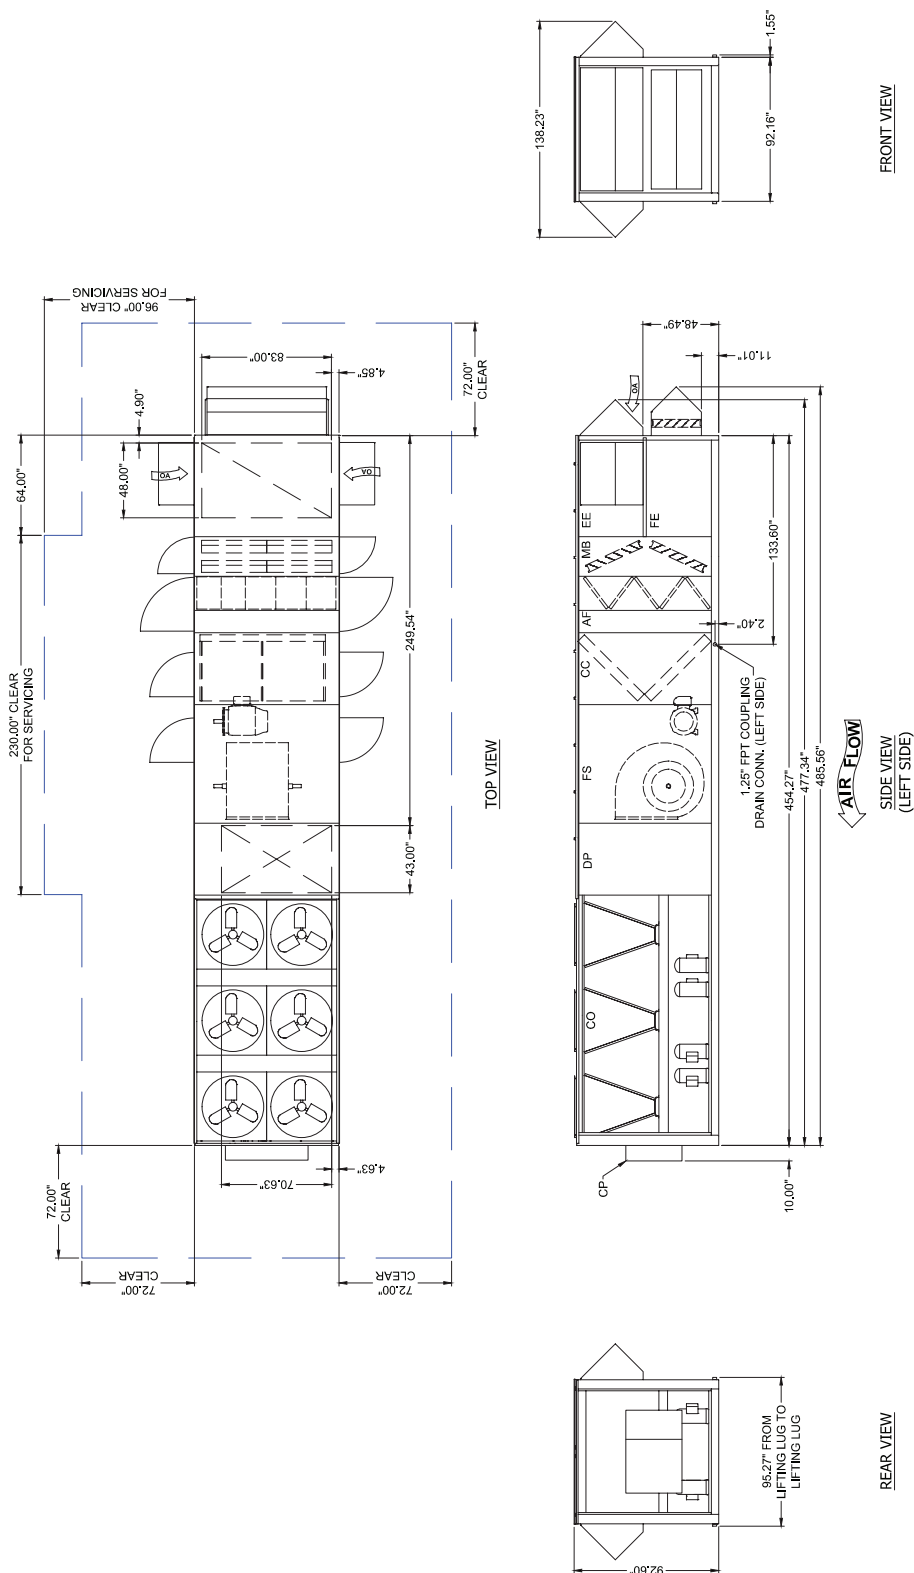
GENERAL ARRANGEMENT DRAWING
